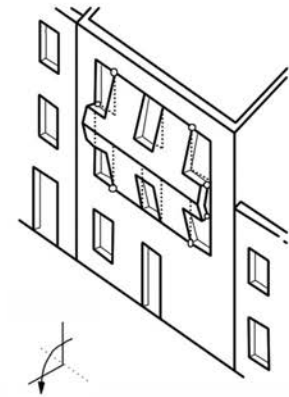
The building presents the activation of vertical arch mechanism due to lack of good connections between floor and masonry wall and to hammering of floor on rubble masonry, Faizzone village
